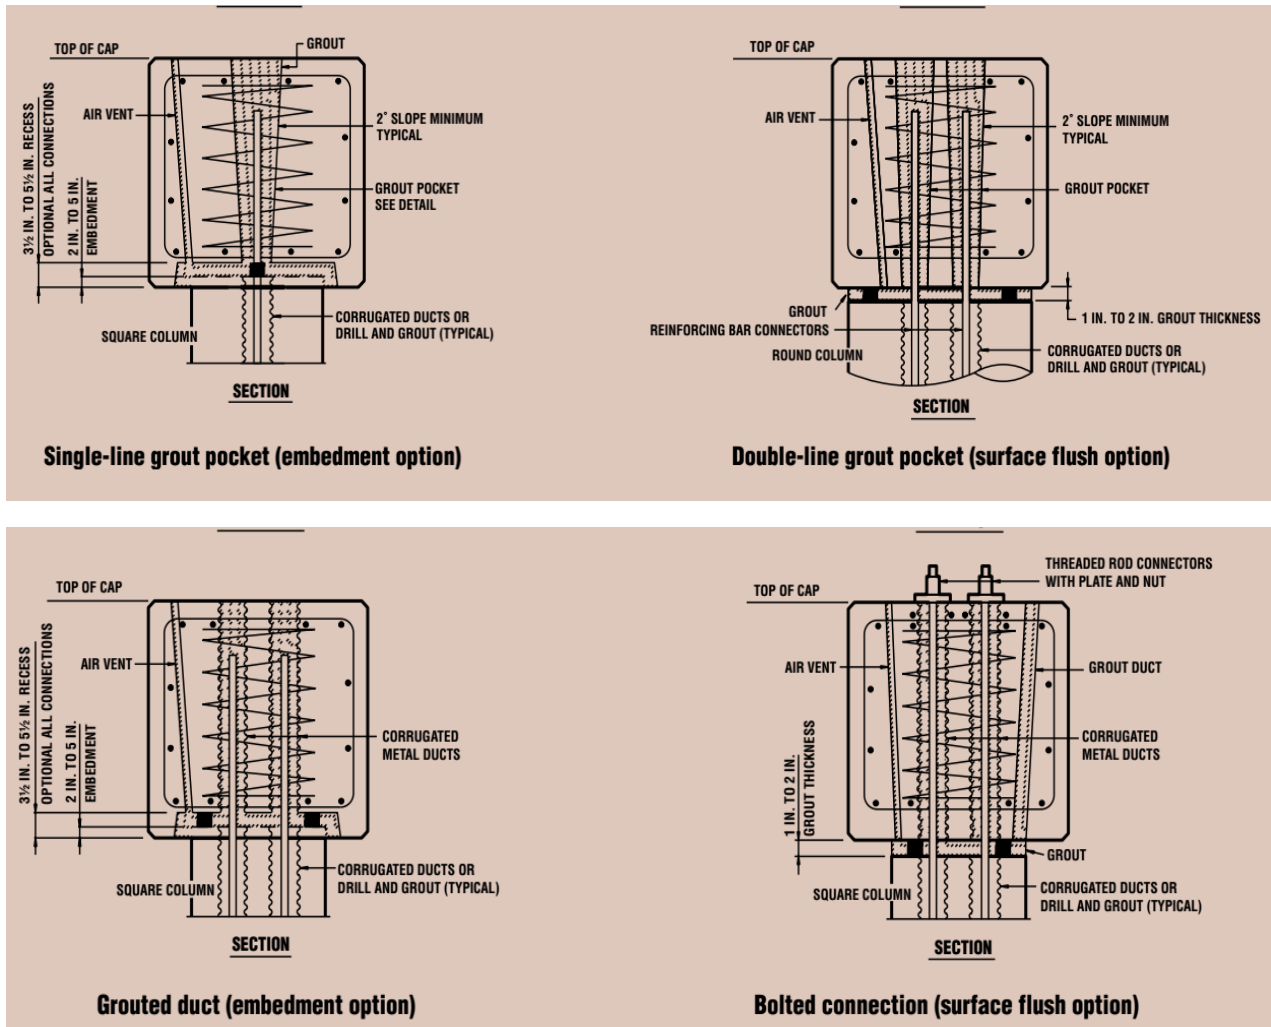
Beam-to-column connection details explored by Matsumoto et al. (2008)
